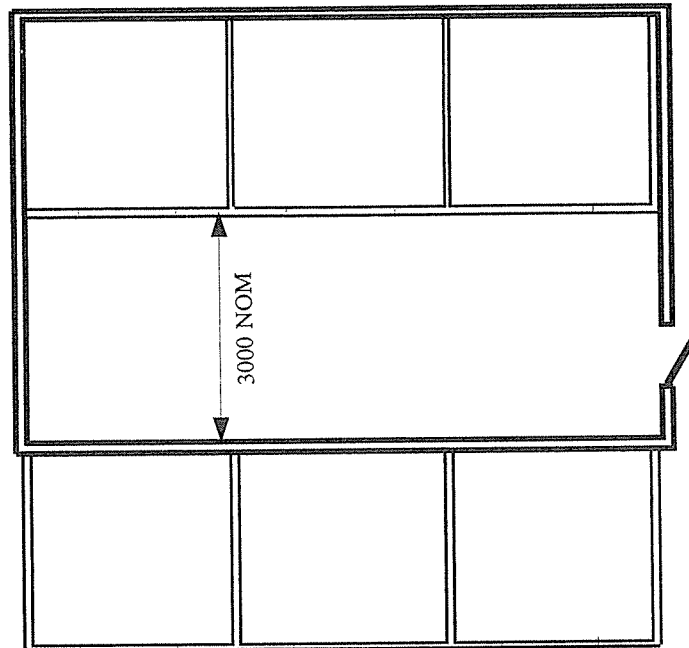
Typical Otis Well and Machine Room Plan, Multiple Shafts Front to Back
